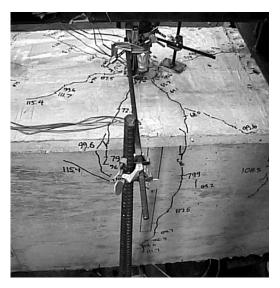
Crack Pattern at Maximum Load (VD03)
